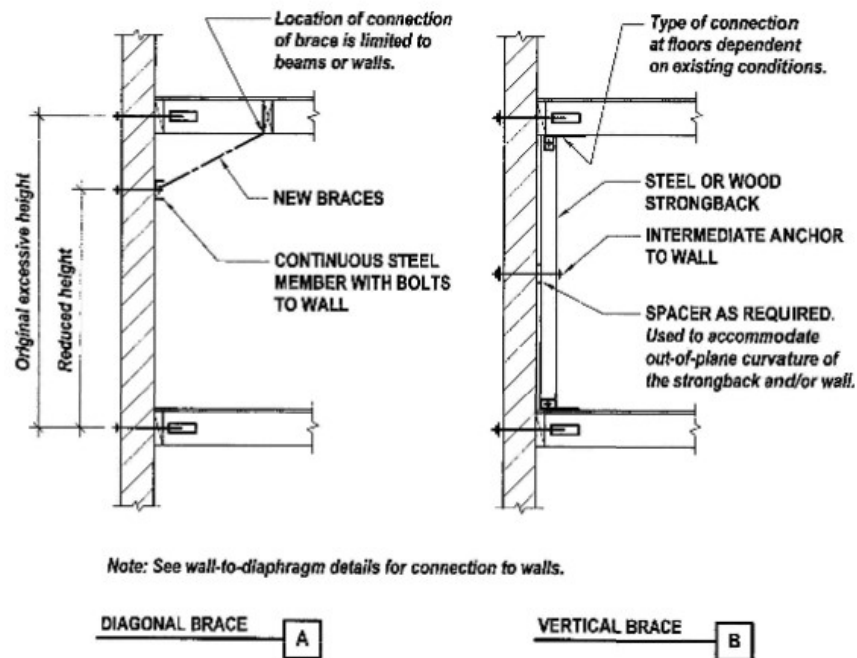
Exposed Out-of-Plane Wall Bracing
